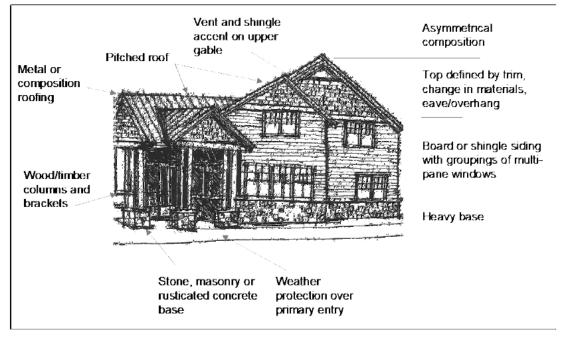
F: Typical Building Elements in Sandy Style (Mixed Use Example)
